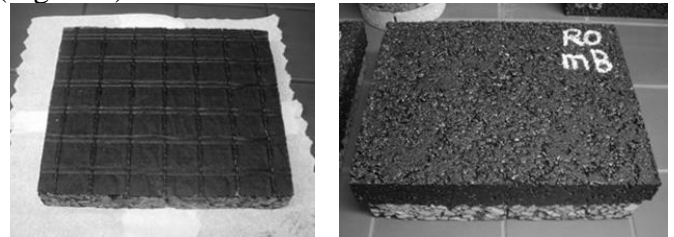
Pre cracked specimen with asphalt reinforcement
